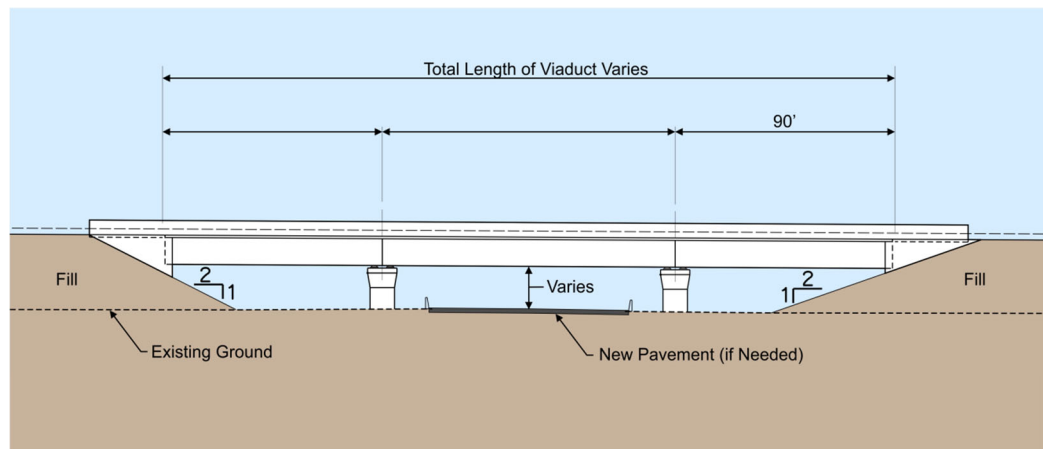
Typical Cross Section of Roadway Grade-Separated beneath the High-Speed Rail Guideway
